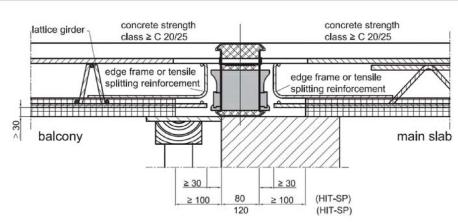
Example of the connection HIT-HP/SP MVX to element slabs with statically effective in-situ layer
